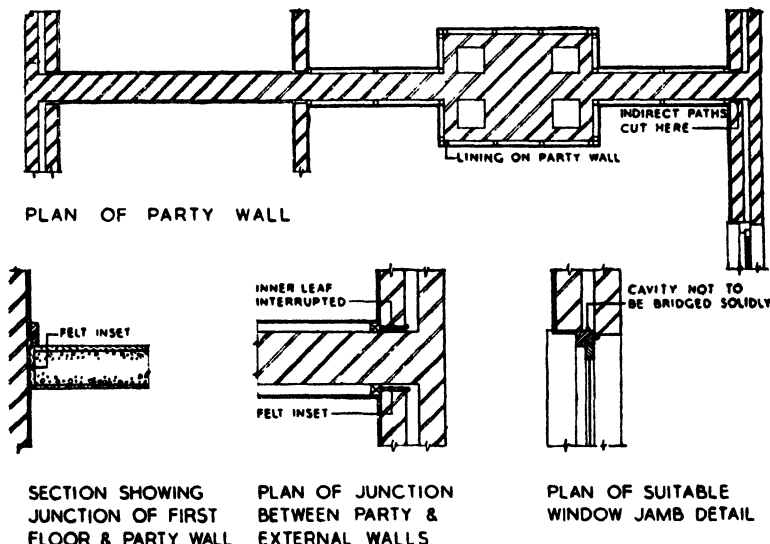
B. TREATMENT OF PARTY WALL AND DISCONTINUITY IN FLANKING WALLS IN DWELLING HOUSES
